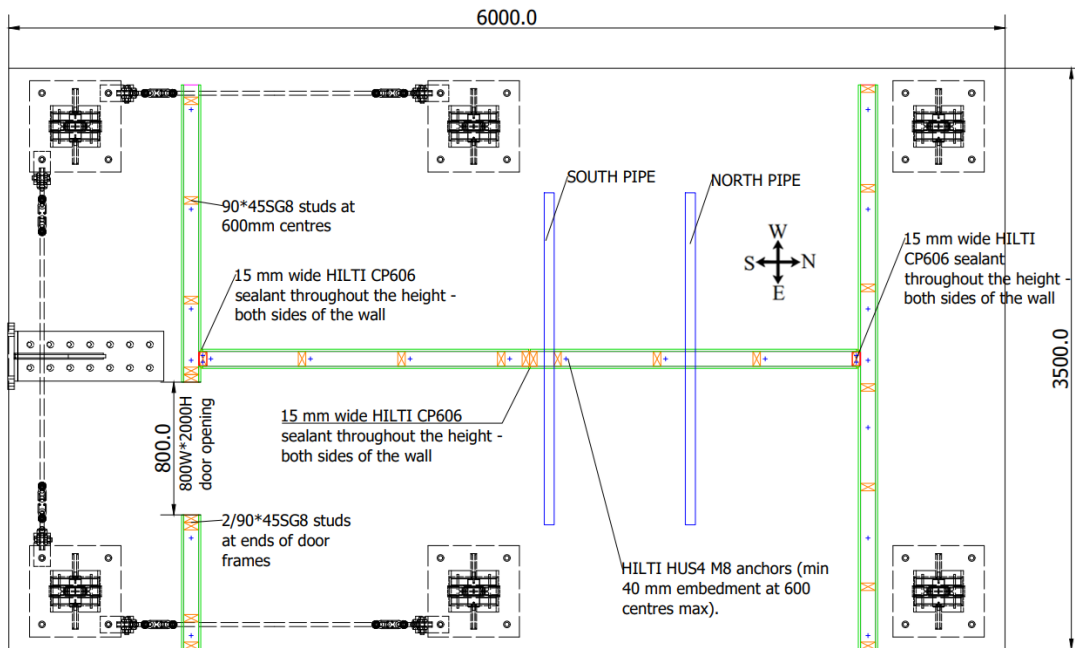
Plasterboard lining to timber framing attachment plan with 15 mm sealant joint locations shown (dimensions in mm)
